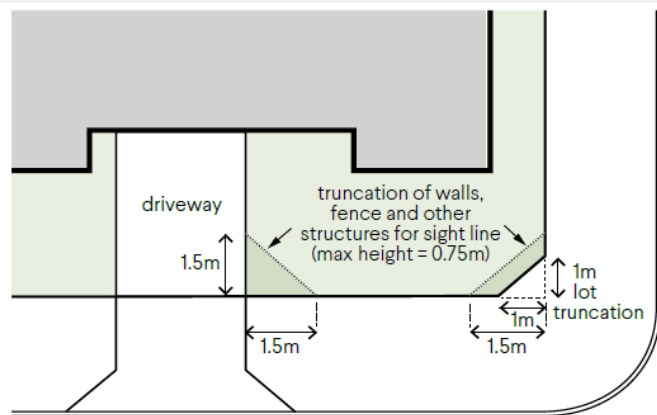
Truncation at street corner to provide sightlines (refer A3.8.7).
